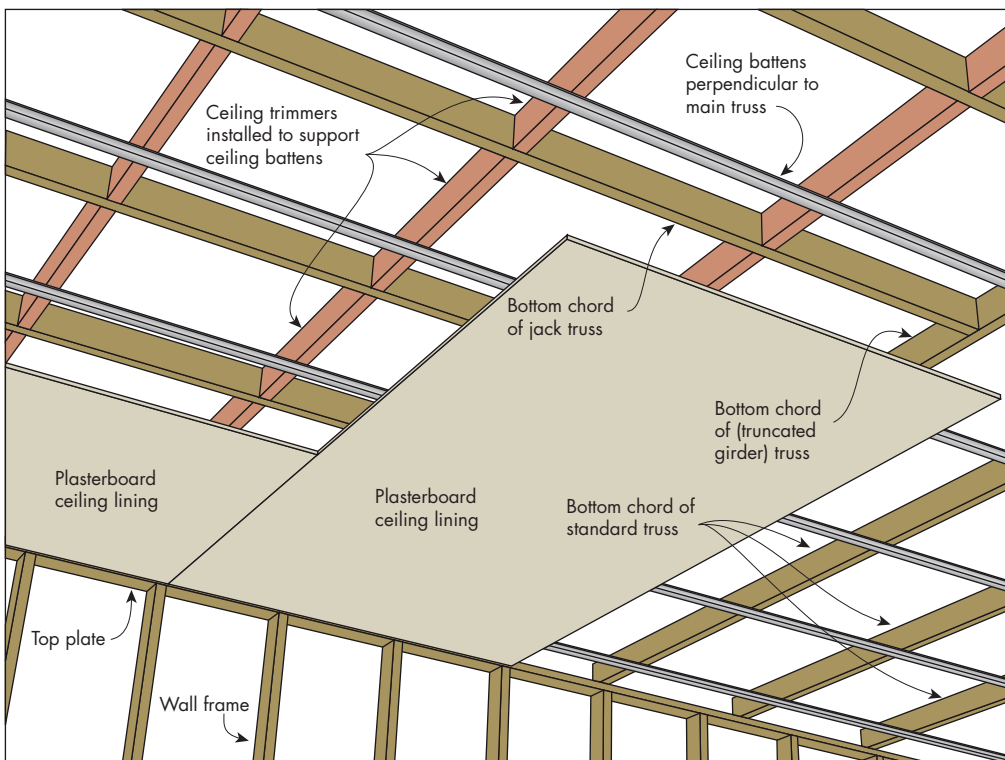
Install Ceiling Trimmers for Ceiling Batten Systems. Install Plasterboard Perpendicular to Ceiling Battens
